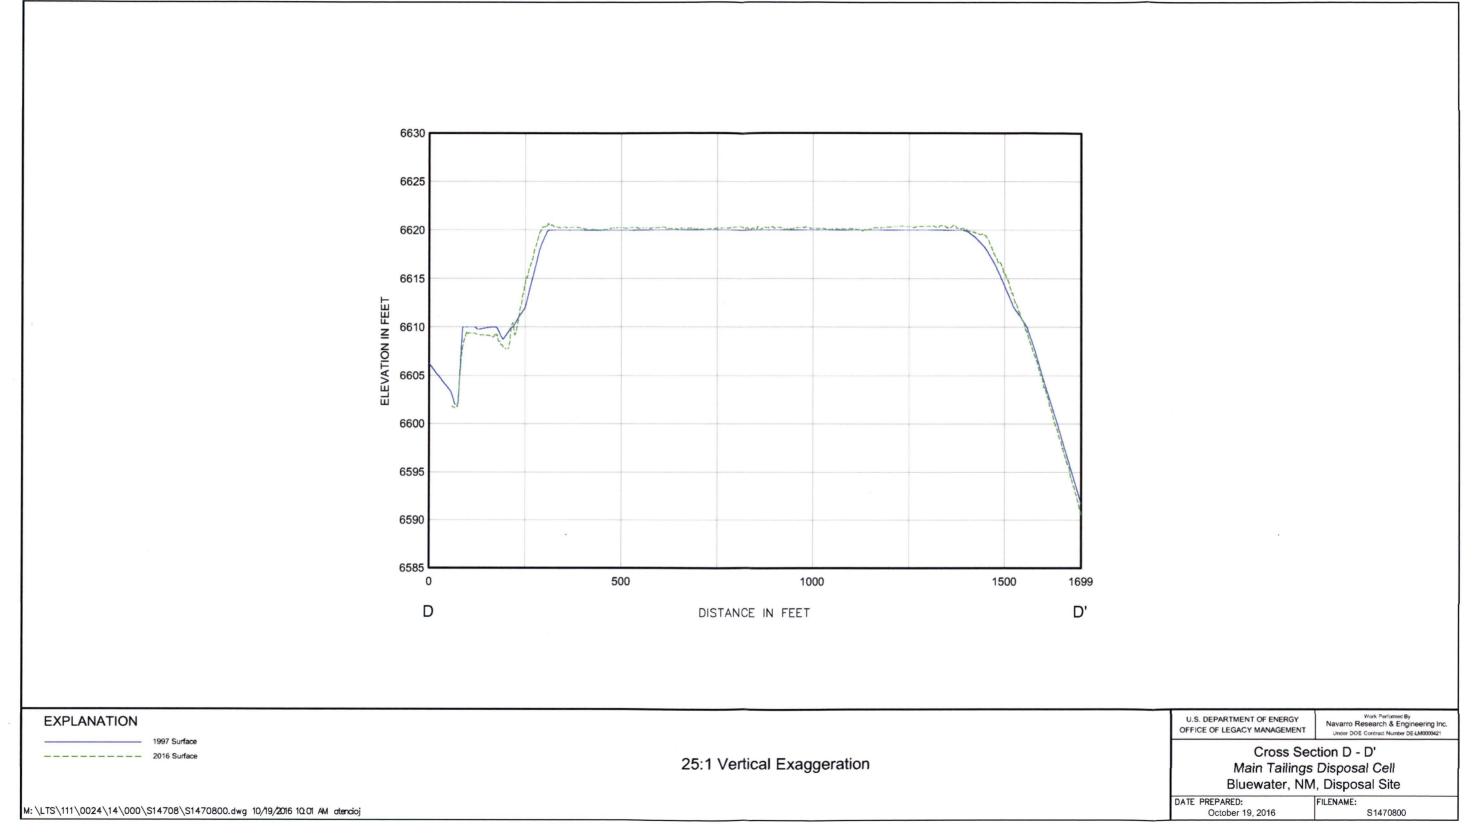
Cross Section D-D' of the Main Tailings Disposal Cell
